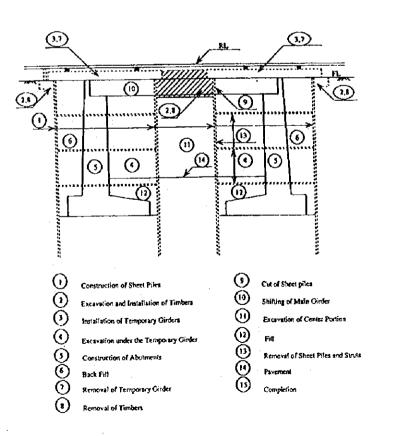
New Bridge Construction Method under Construction Girder
